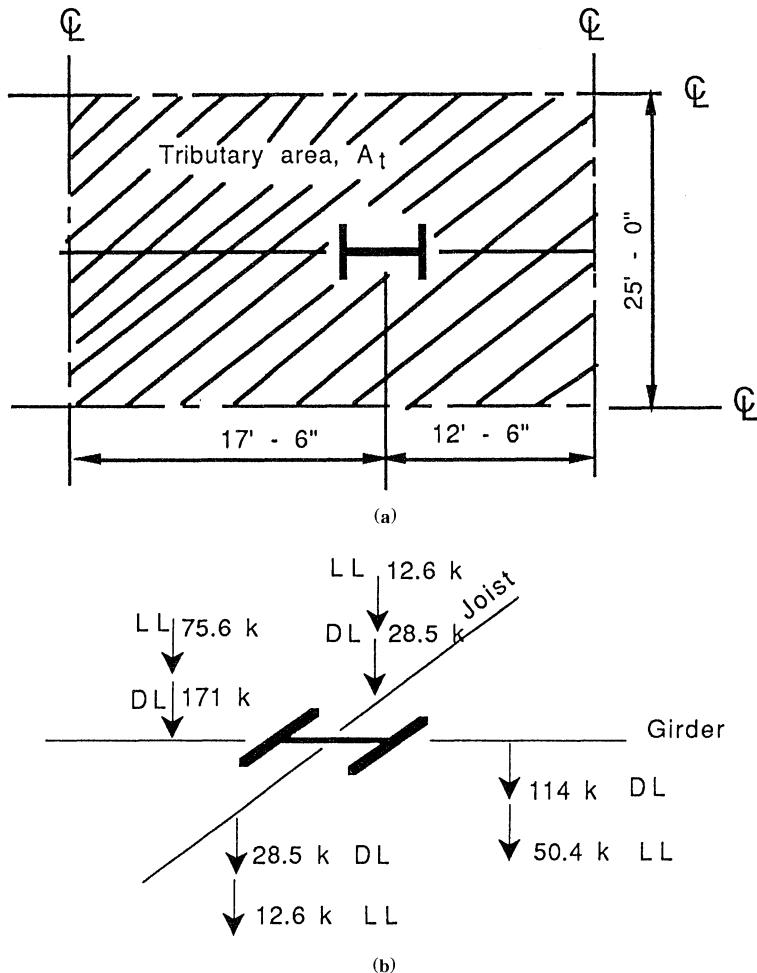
Exterior column load calculations. (a) Typical interior column adjacent to exterior bay. (b) Loads on a typical interior column.
